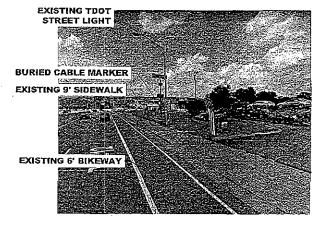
NORTH ALONG ROSA L PARKS BLVD
